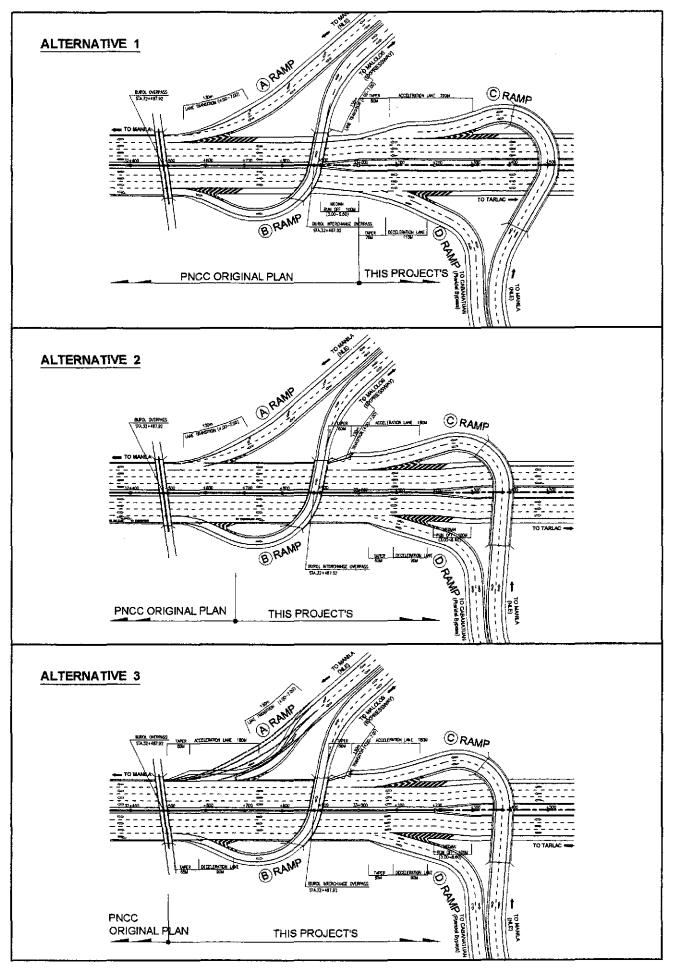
PLAN OF ALTERNATIVES
